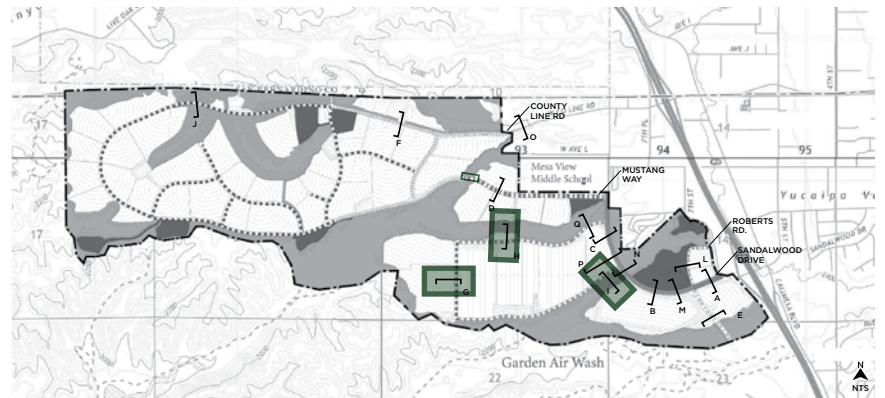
ENLARGEMENT MODIFIED COLLECTOR STREET SECTION I
